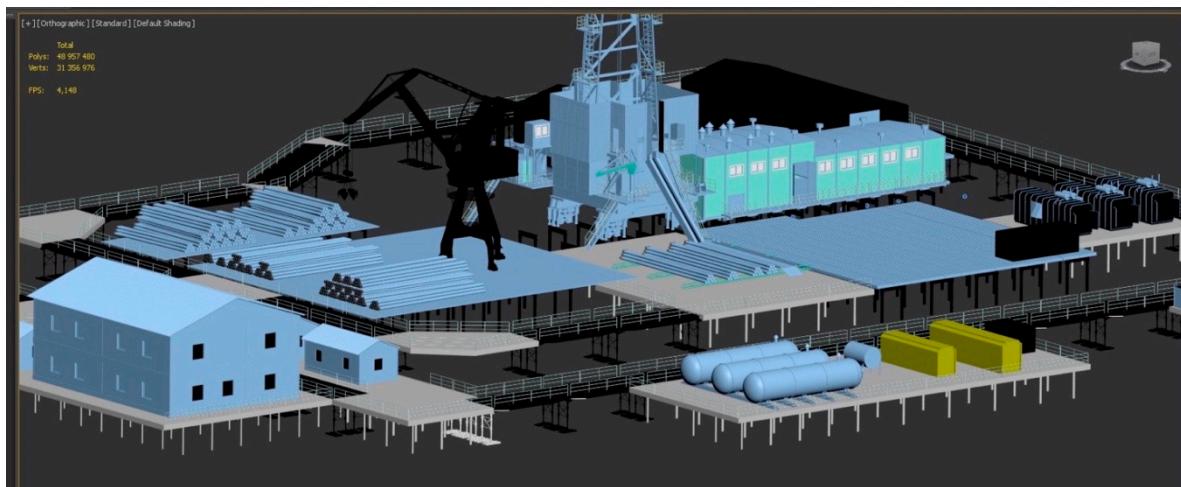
Prototyping of production infrastructure facilities on a pile foundation.
